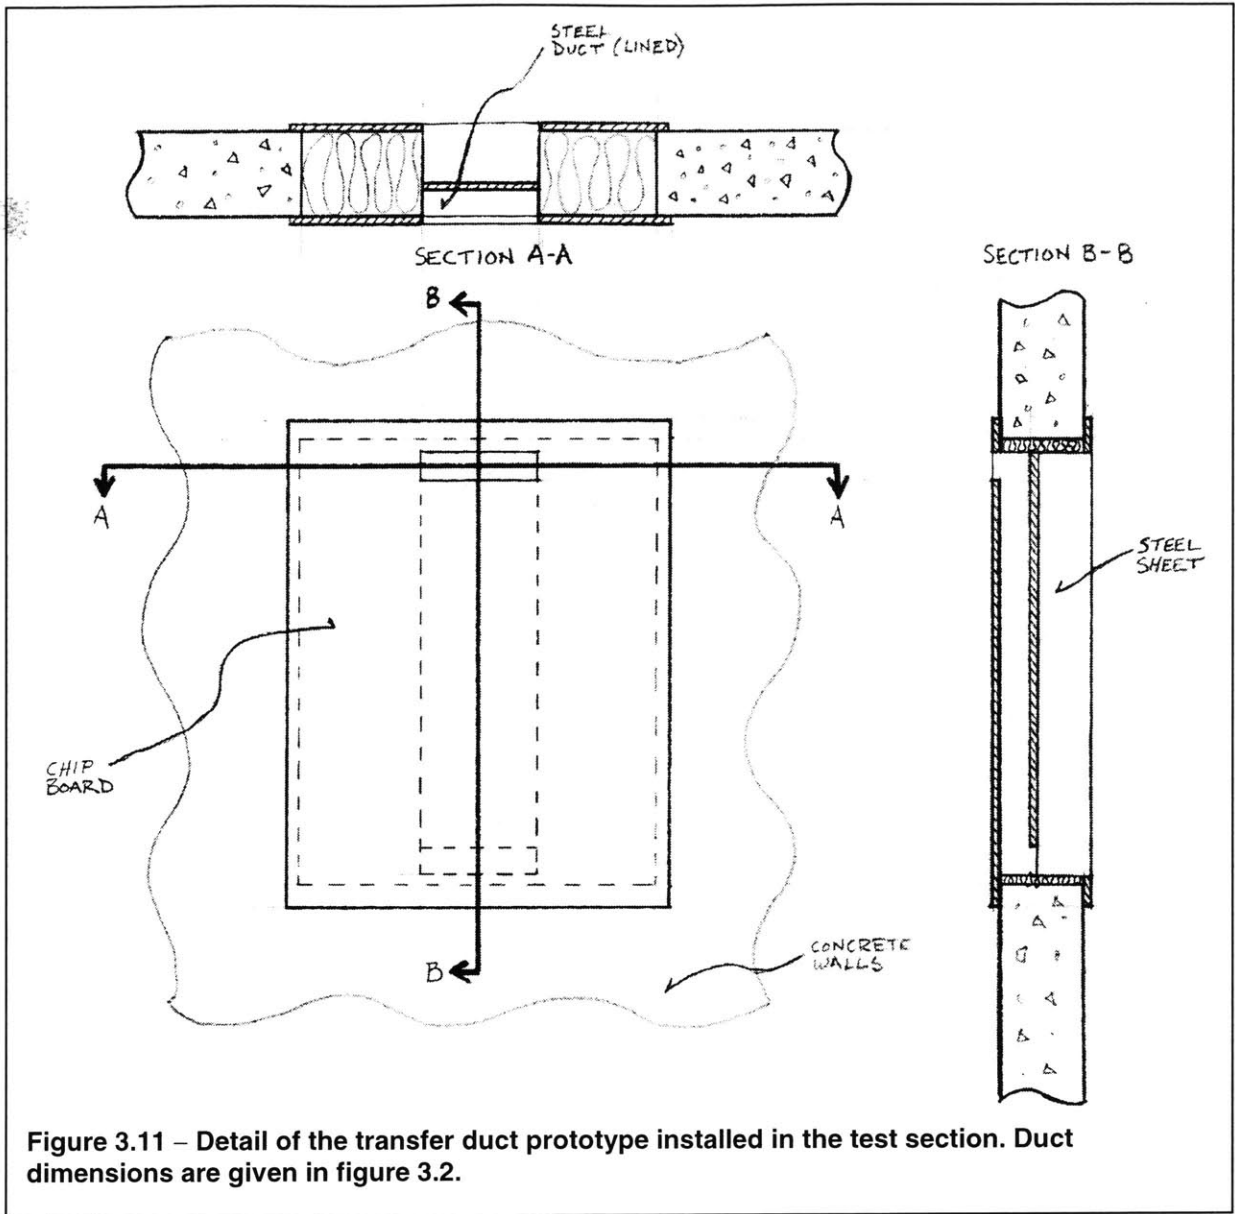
Detail of the transfer duct prototype installed in the test section. Duct dimensions are given in figure 3.2.
